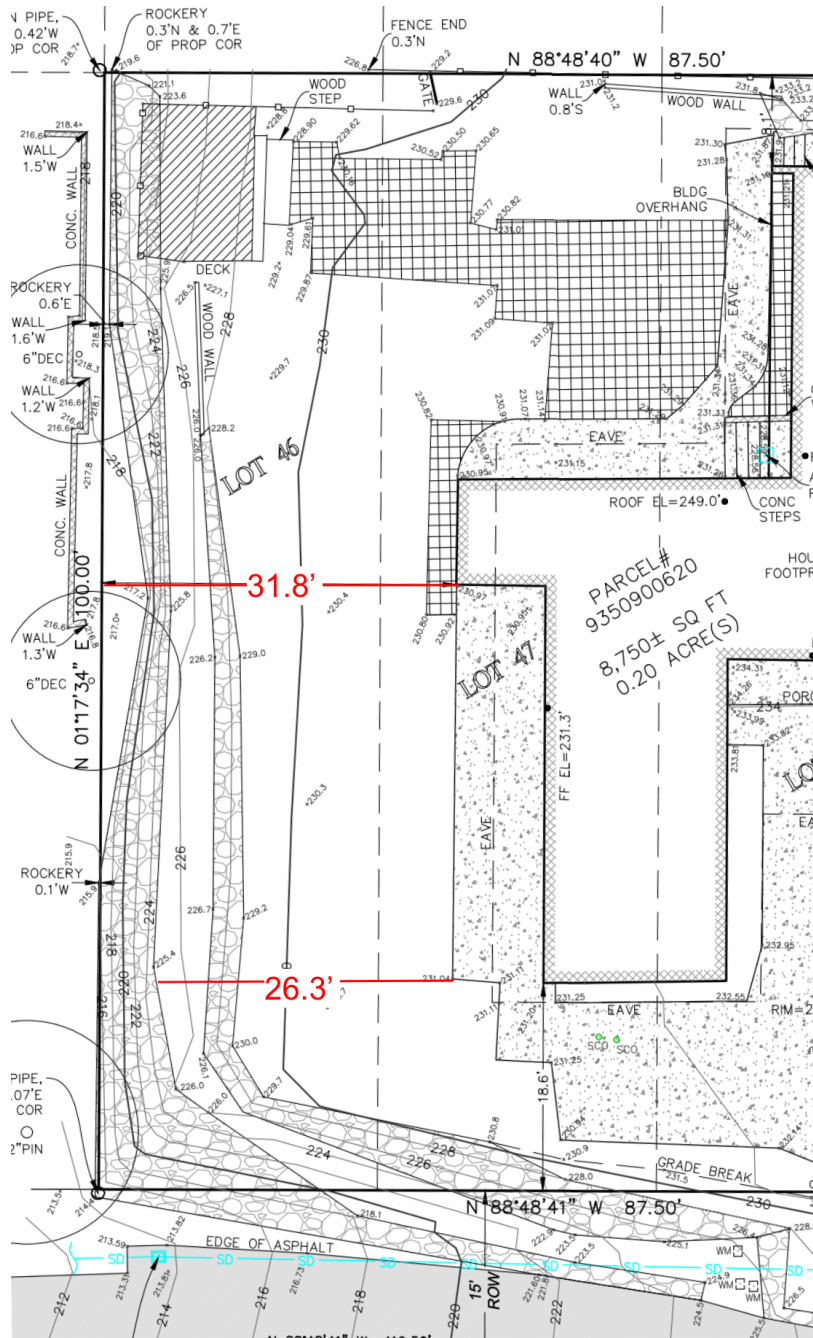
Applicant's 2021 Survey of 6950 SE Maker showing distance from retaining wall to walkway
